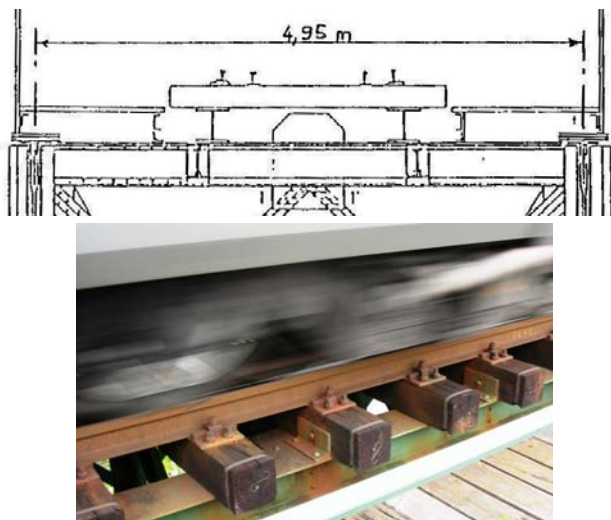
Open deck carriageway mounted on the wrought iron girder.
